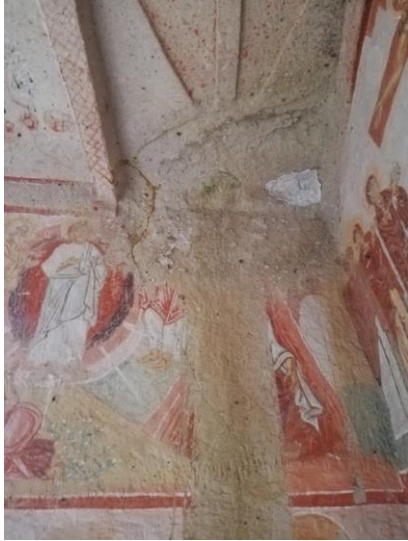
The Saklı Church western murals distortion detail (Ertürk, 2020, p.151)
